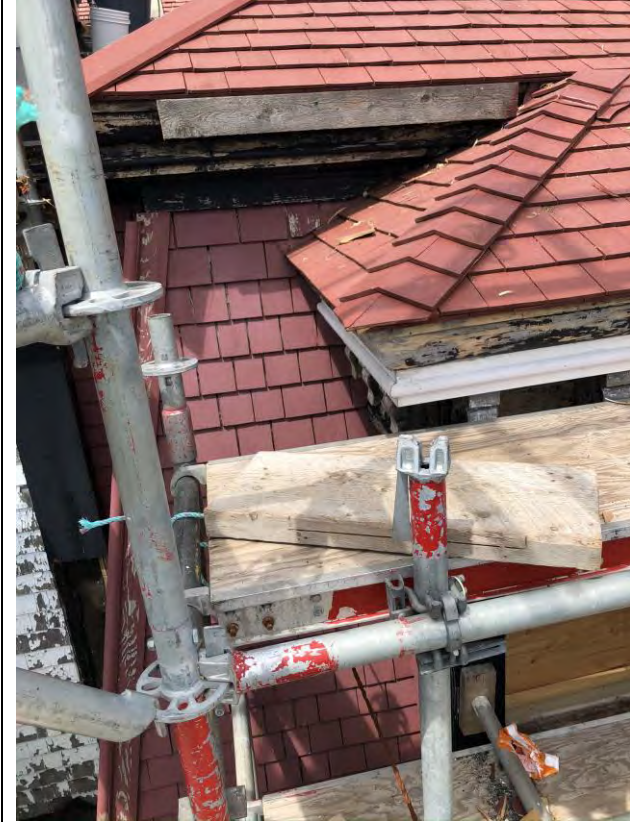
Cladding beside window E 18. Eaves to be completed.
